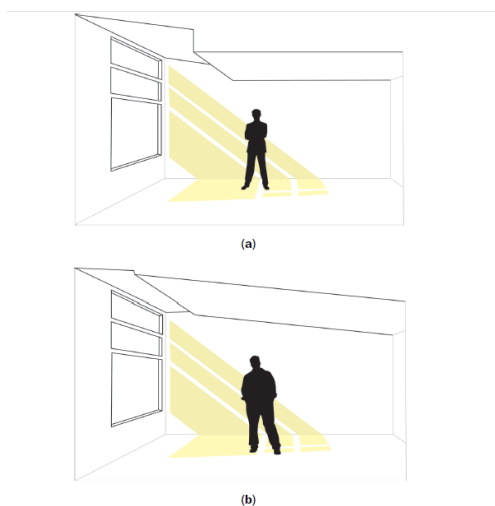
(DL8) (a) Raised Ceiling at Façade and (b) Sloped Ceiling at Façade
